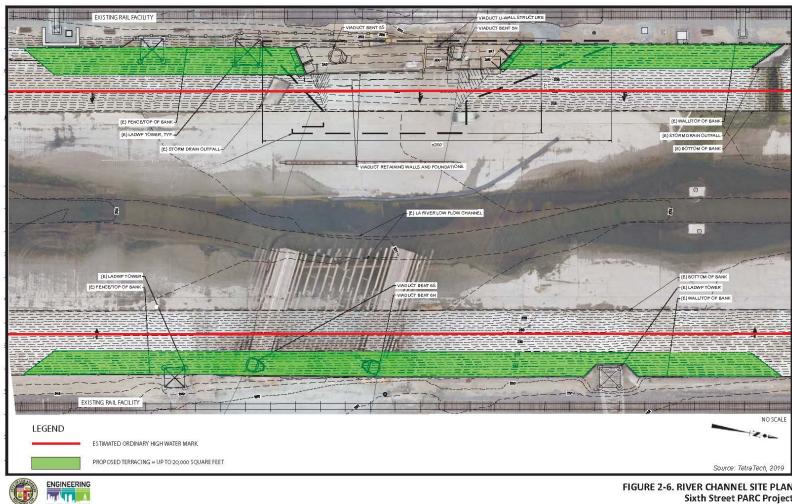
RIVER CHANNEL SITE PLAN Sixth Street PARC Project
